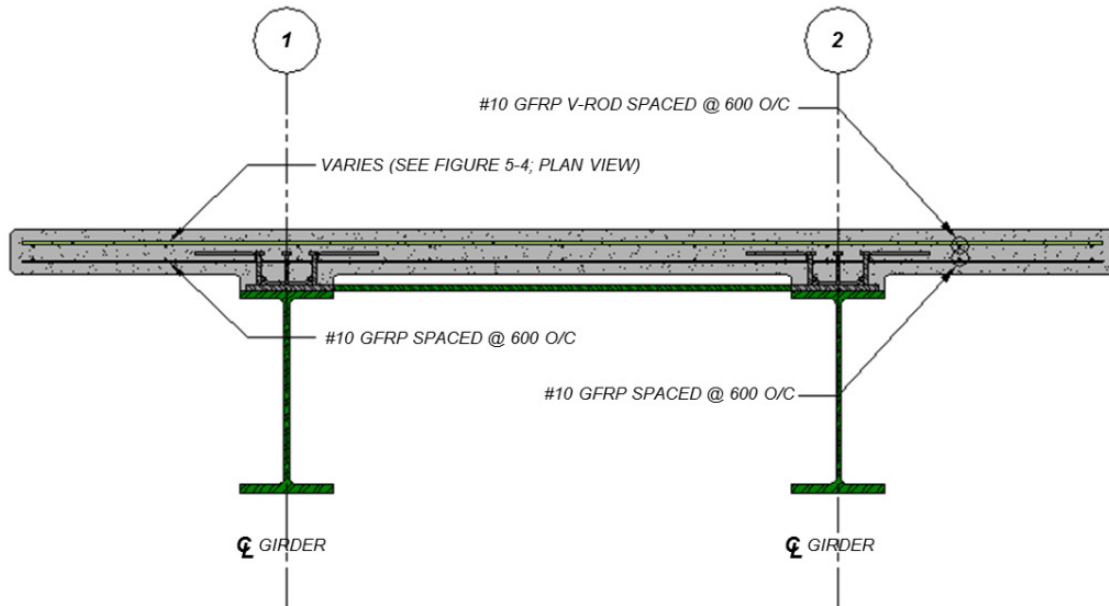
Typical cross-section of un-stiffened cantilever slab overhang showing internal reinforcement (Klowak, 2007)
